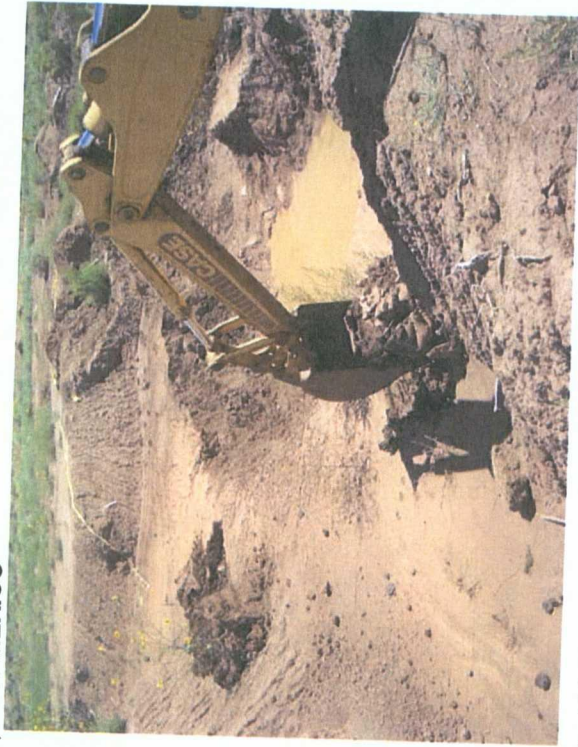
Collecting Confirmation Soil Sample CS-34, looking northeast
